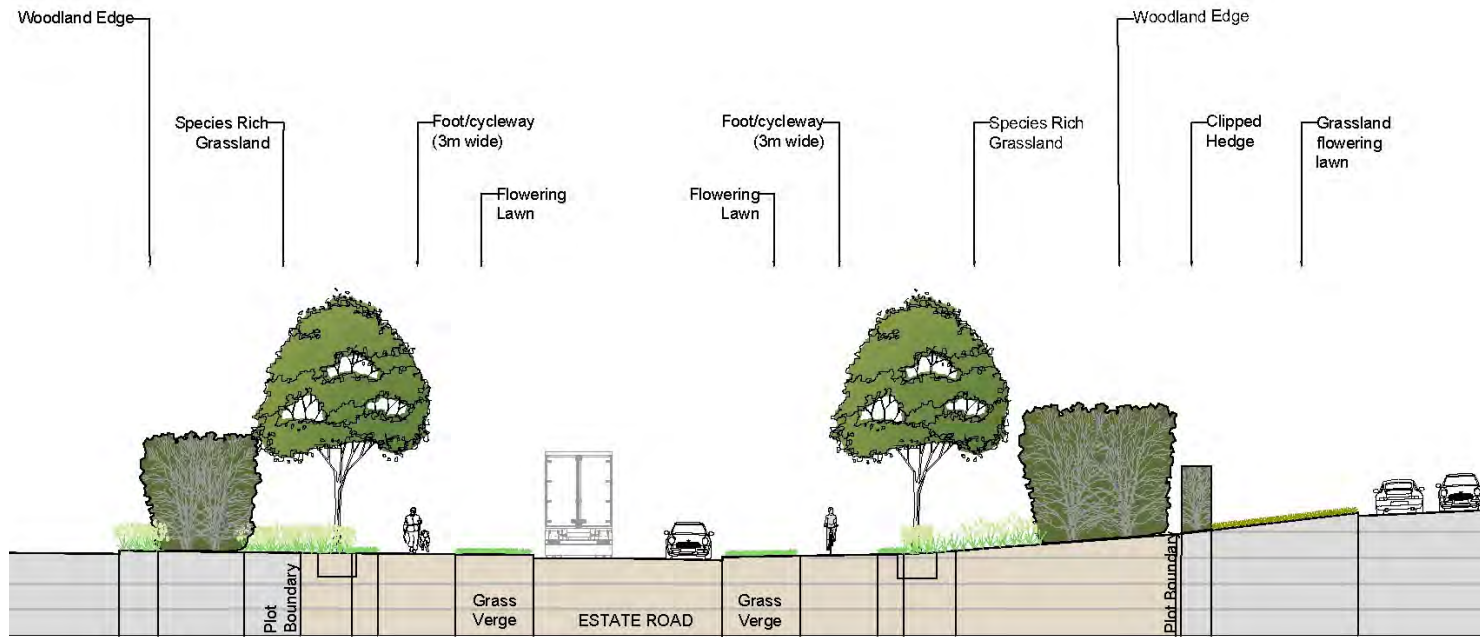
INDICATIVE ROAD CROSS SECTION GRAPHIC
